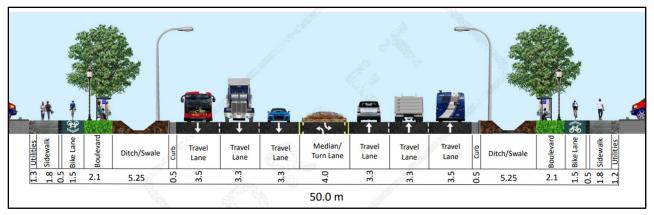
Six Lane Arterial Road Conceptual Cross-Section Design
